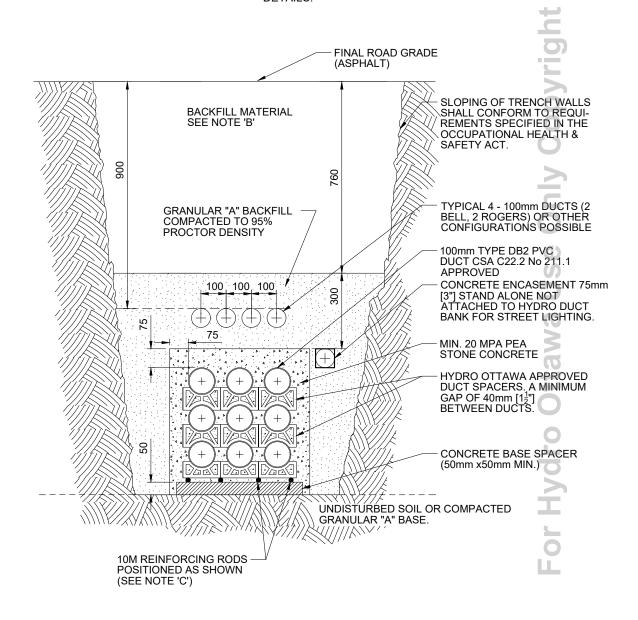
TYPICAL CONCRETE DUCT BANK SECTION VIEW
